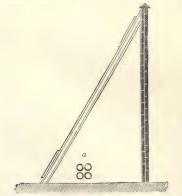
SECTION OF HOUSE OR GLASS CASE FOR COVERING PEACH AND NECTARINE TREES ON WALLS, showing (a) Position for four Jin. Hot-water Pipes.
